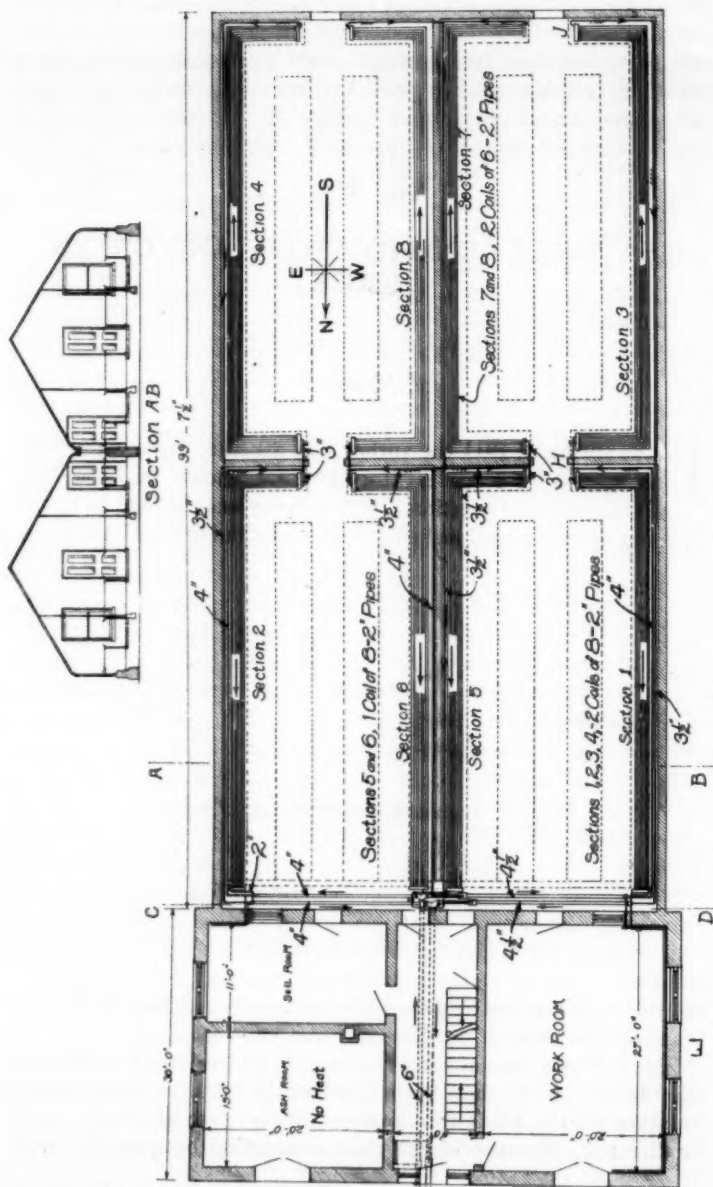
GROUND FLOOR PLAN OF THE NEW CONSERVATORY.
